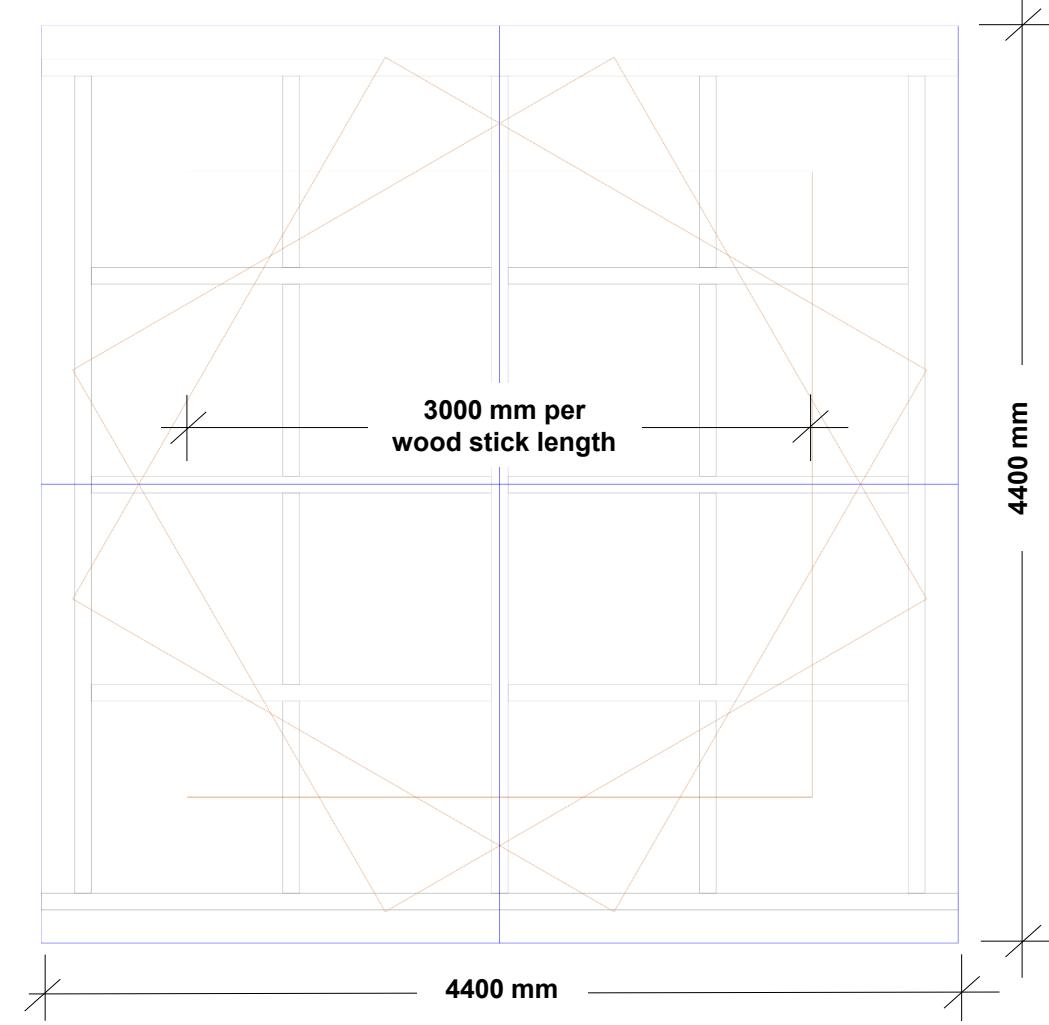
Test setup in plan view: wood stick orientation shifted 60° per layer.
